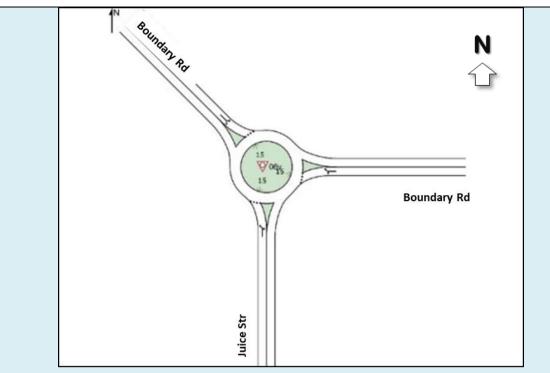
Proposed traffic circle configuration at the corner of Juice Street and Boundary Road
